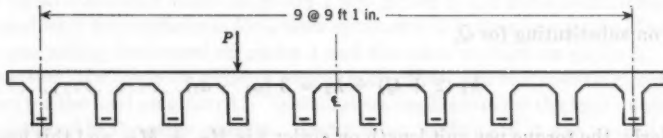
CROSS SECTION OF T-BEAM BRIDGE
